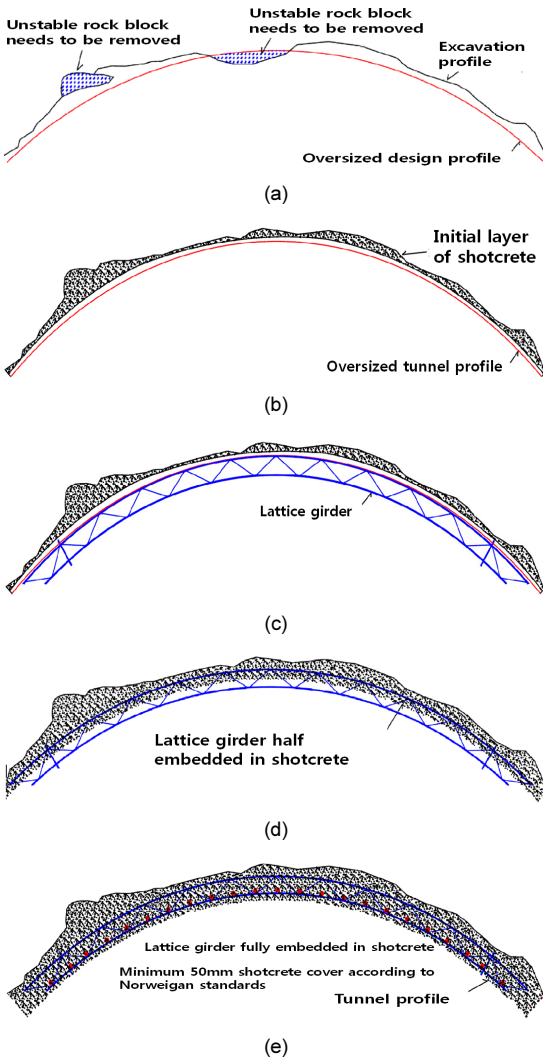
Construction procedure of lattice girder : (a) Excavation; (b) Placing Initial shotcrete; (c) Installation of Lattice girder; (d) Lattice girder half embedded in shotcrete; (e) Lattice girder fully embedded in shotcrete
